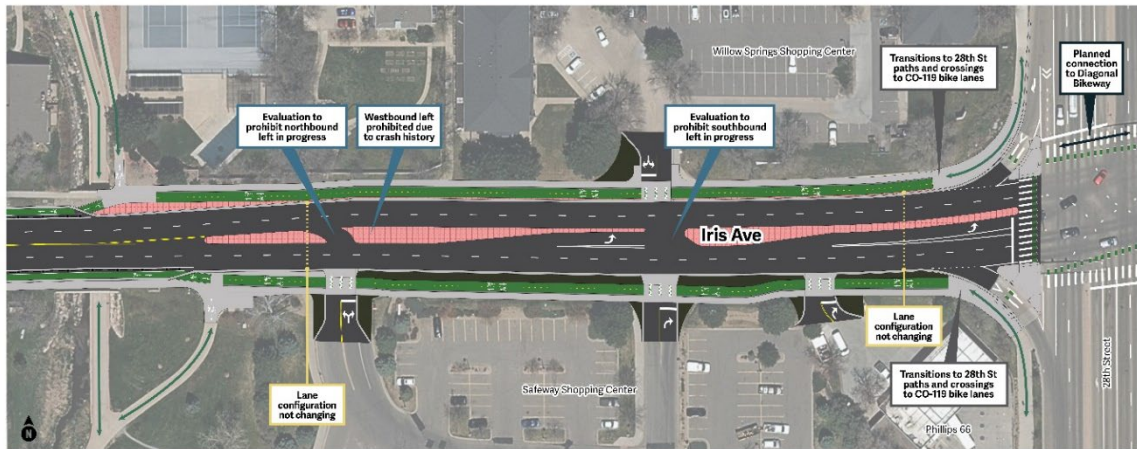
28th Street bookend improvements providing separate spaces for people walking and biking and improved connections
